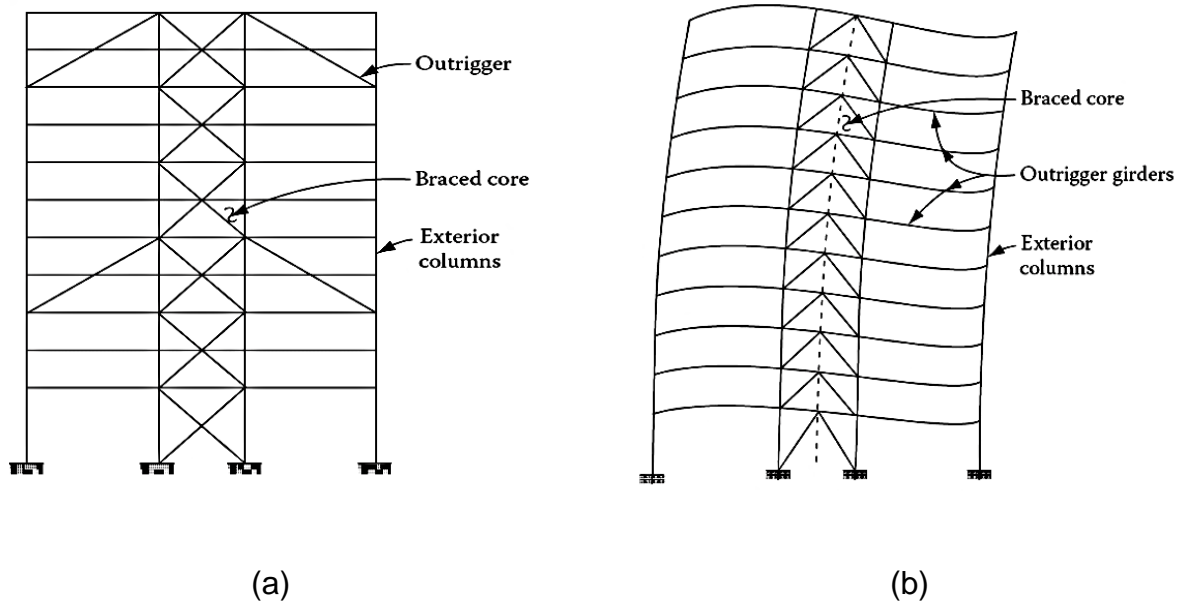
(a) Extended diagonals as outrigger; (b) moment resistant connected girders acting as outrigger [39]
